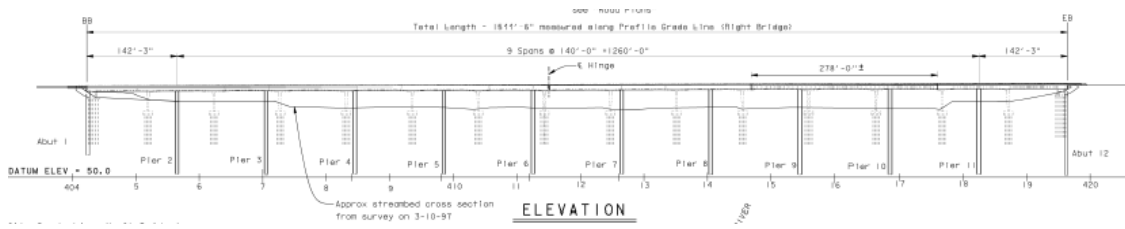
Salinas River bridge, 1550-foot cast-in-place post tensioned box girder bridge.
